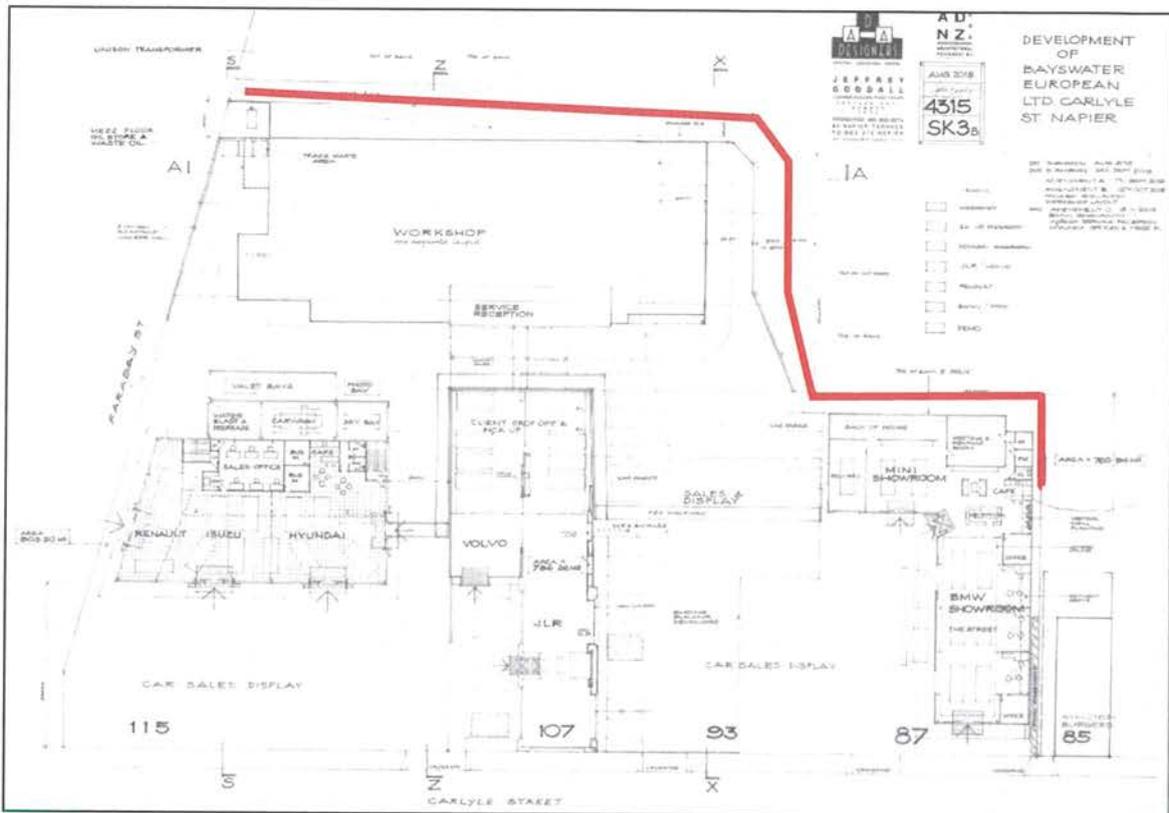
Site Plan – ADA Designers (Indicative location of cut face in RED)
